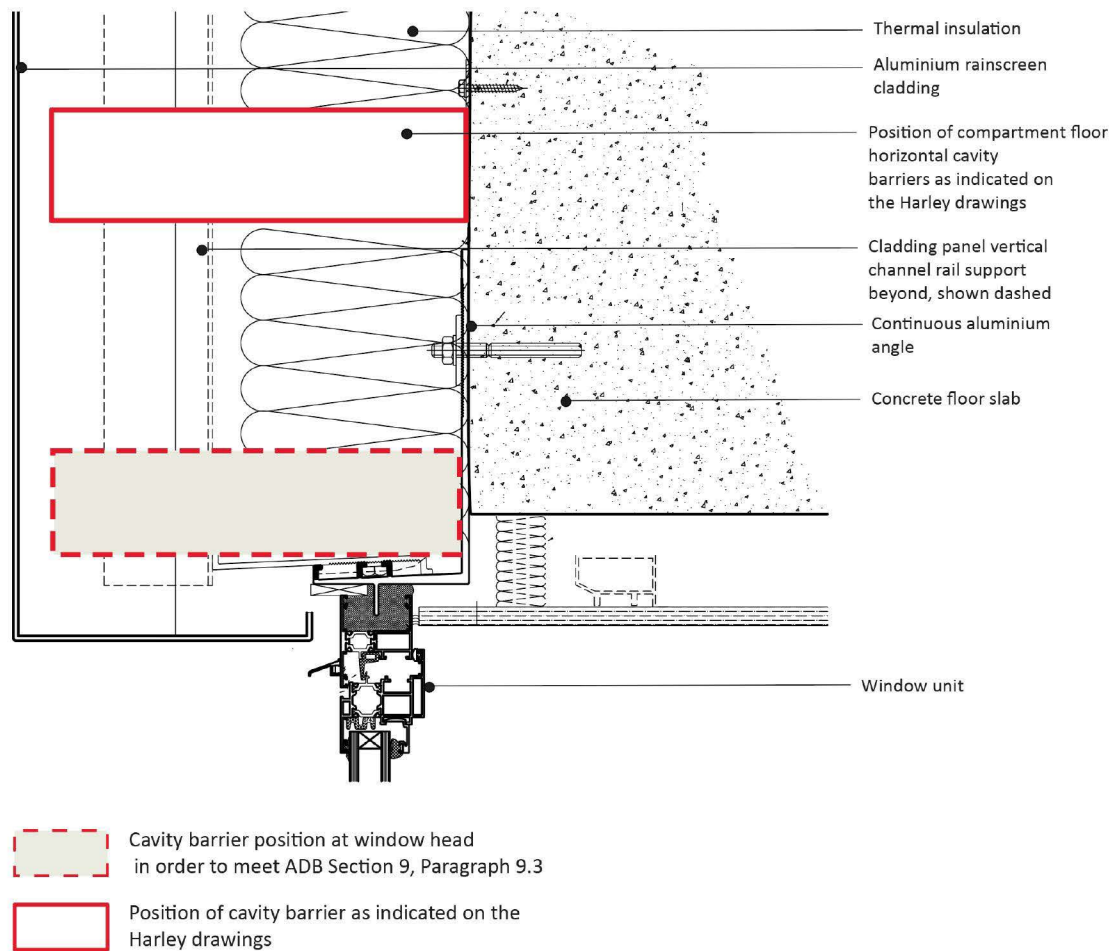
Detail 2 – Typical window sill/ spandrel with location of cavity barrier at window opening noted as per the guidance of ADB2
